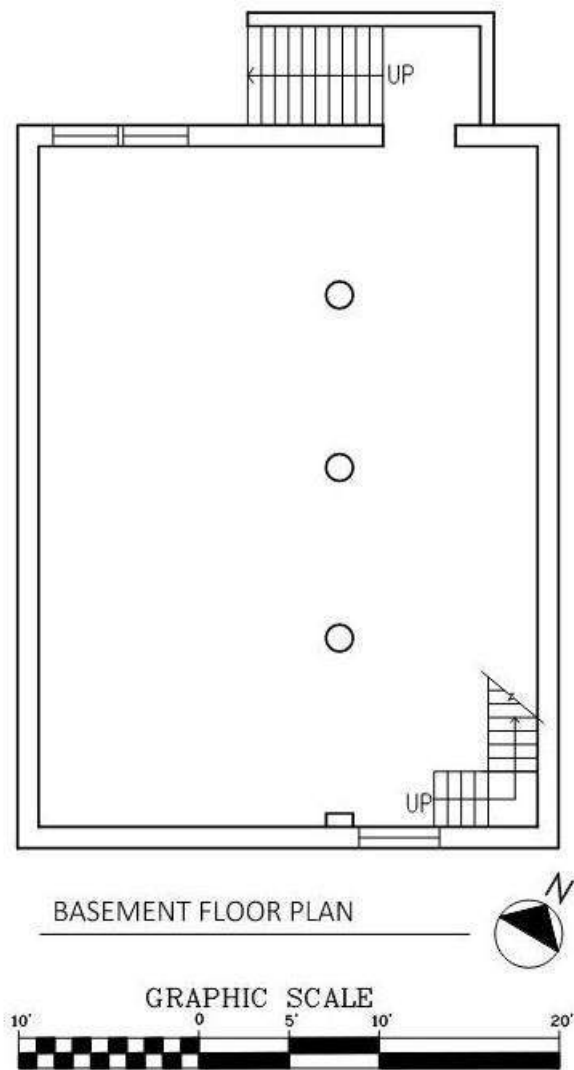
Sketch Plan of Basement of Maintenance Garage.
